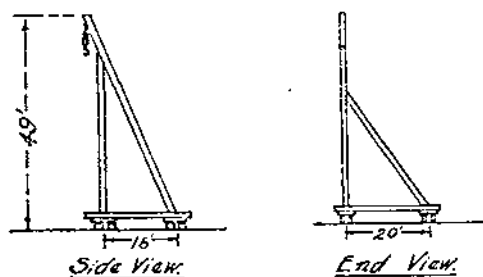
Gantry for lifting Trusses ("F" Hangar).
